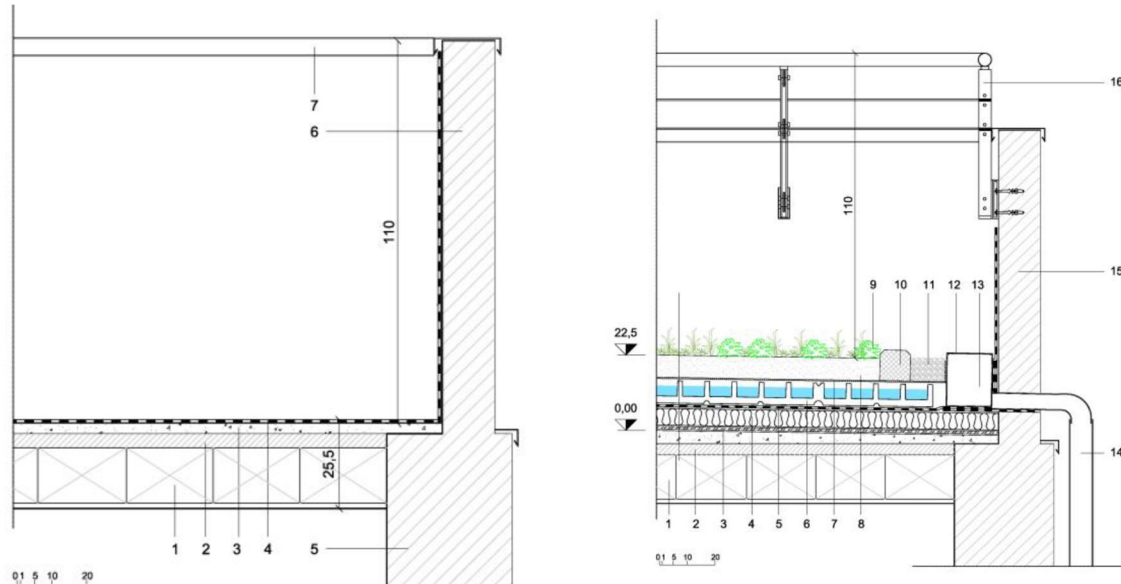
Flat roof (left) and flat green roof after retrofitting (Santi et al., 2020).
